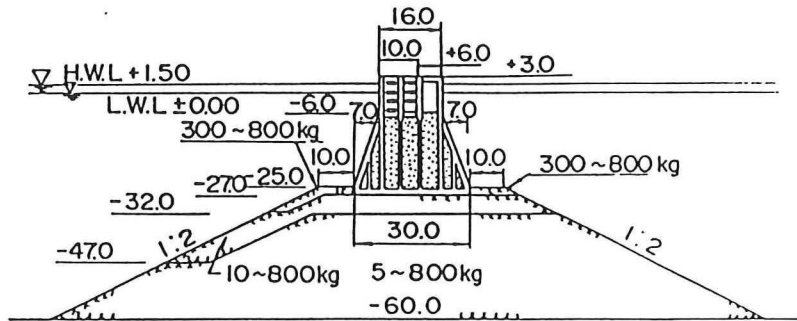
Cross-section of the deepest caisson breakwater at Kamaishi Port
